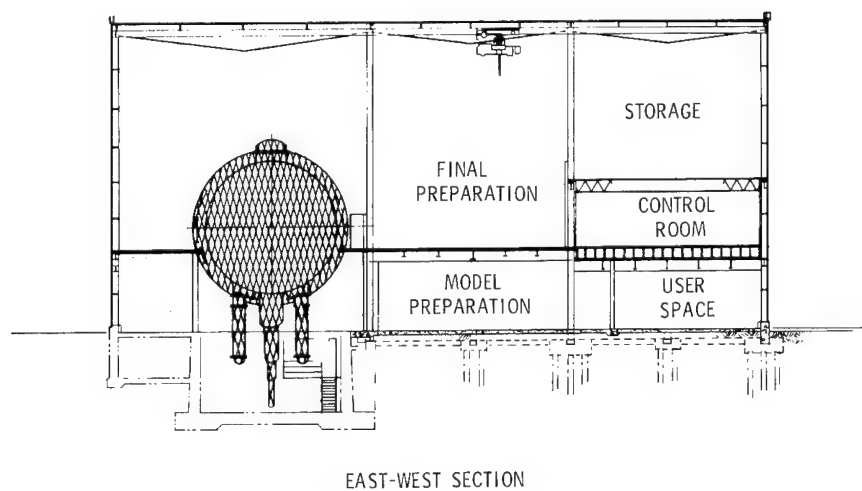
Cross section of building addition showing space arrangement and location of tunnel test section.
